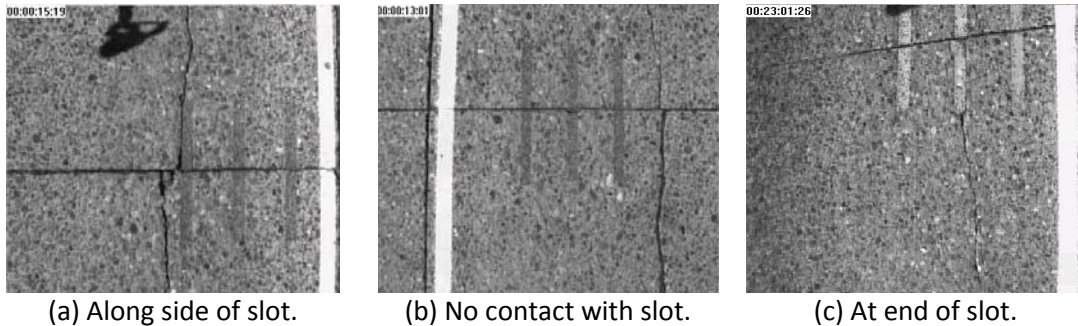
Longitudinal crack location with respect to dowel bar retrofit slot.
